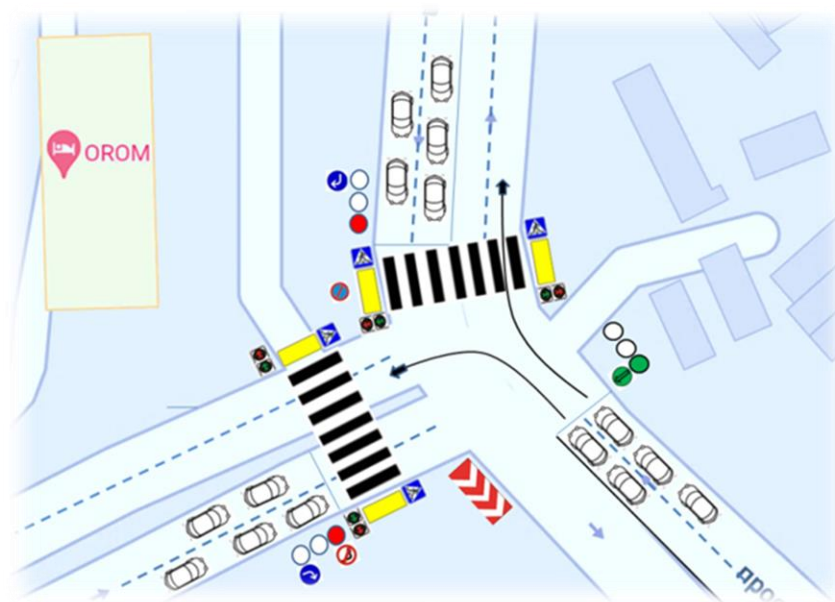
Baburshox Street and S. Zunnonova Street placement of traffic lights and road signs on the cross section
